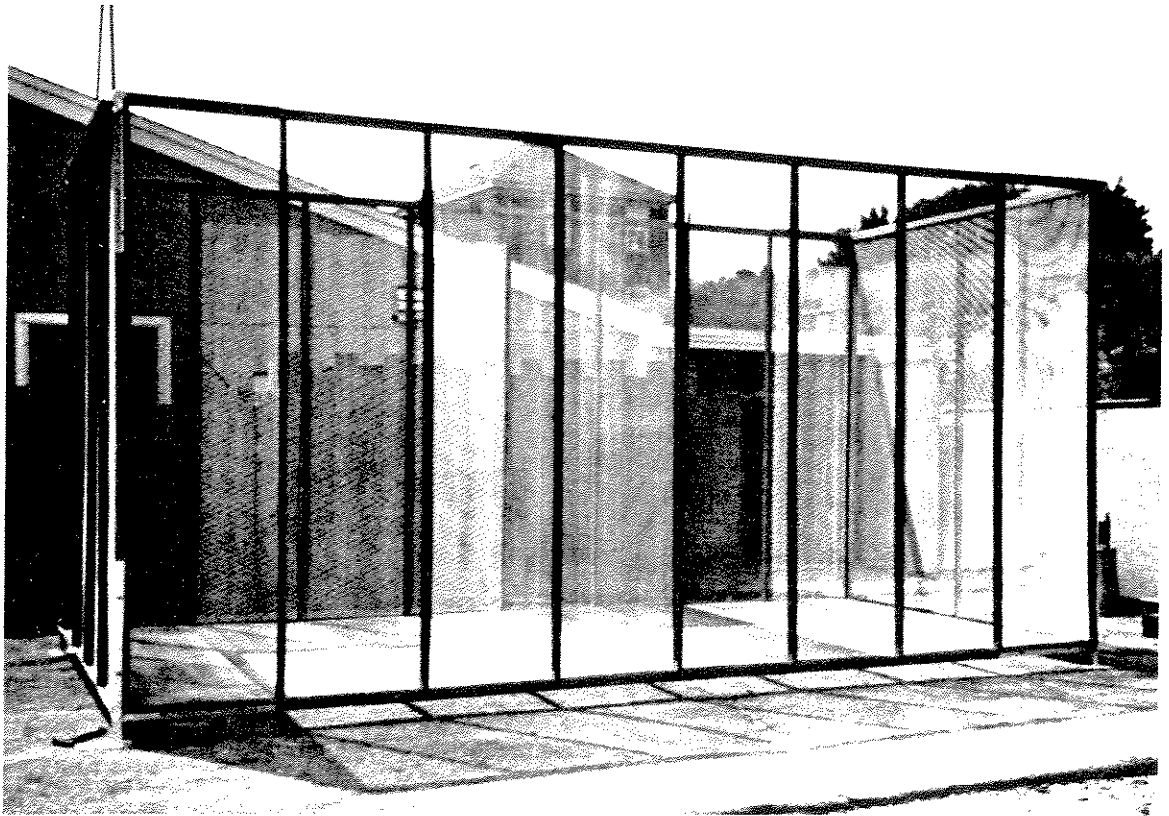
First C-21 cage during trial assembly, note different number of panels for same overall dimensions compared to prototype.
